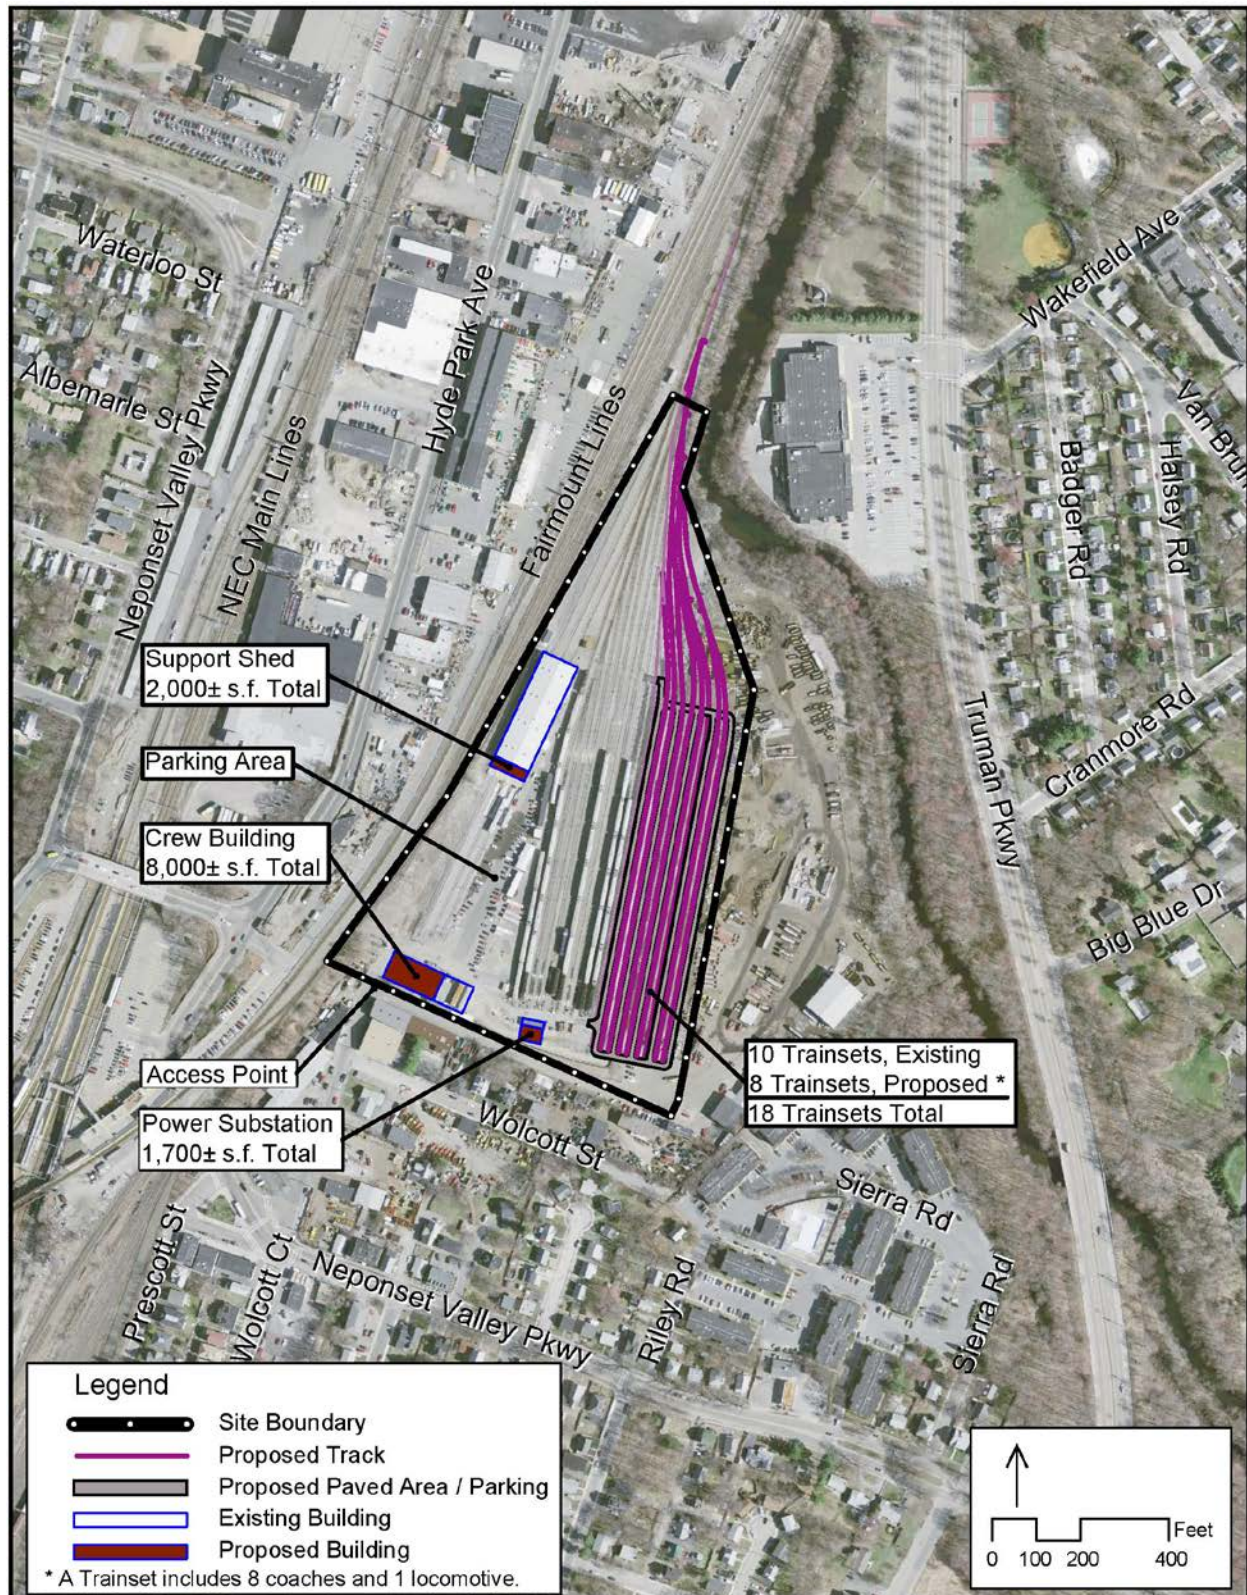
Readville-Yard 2 Layover Facility Site Plan
